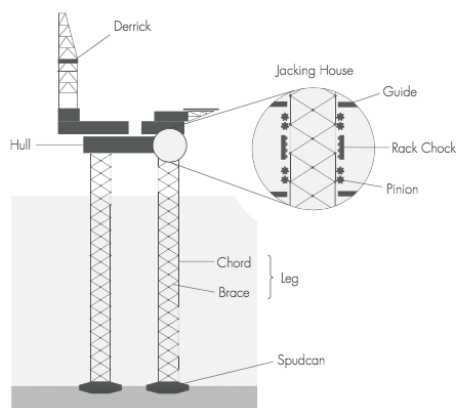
General assembly of a Jack-up platform and its components (Koole, 2015)
